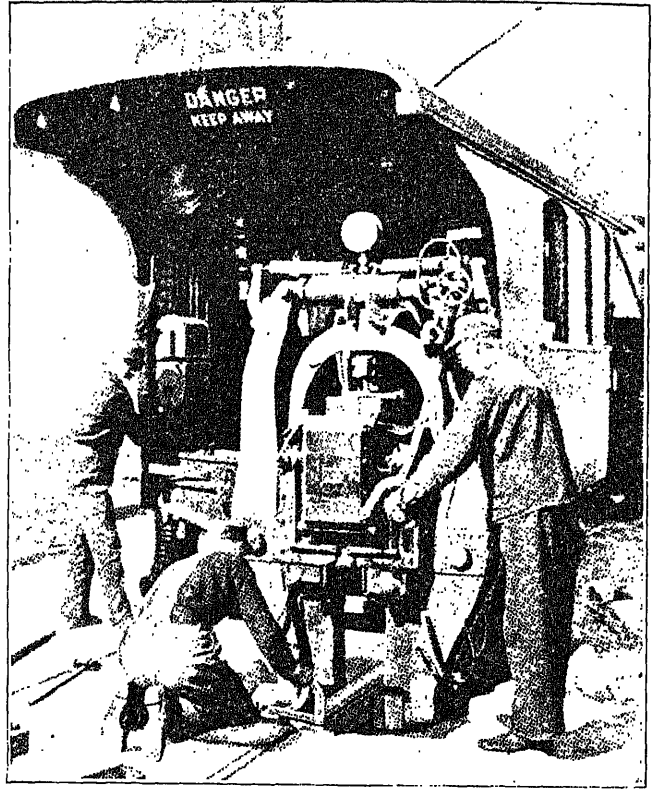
Lorain Machine for Spot-Welding Electric Rail Bonds.
